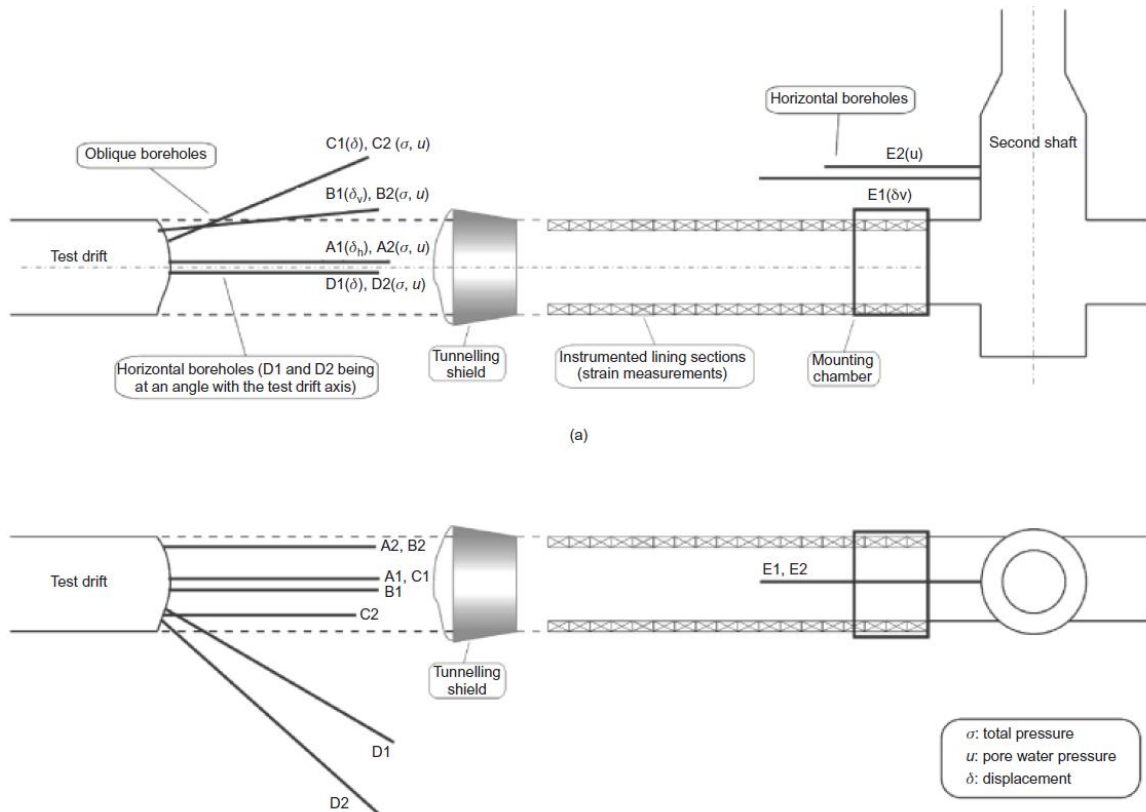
Cross-section and plan view of the Test Drift and Connecting Gallery in the HADES URL, including the instrumentation boreholes (A1, A2, B1, B2, C1, C2, D1, D2, E1 and E2) [19].
